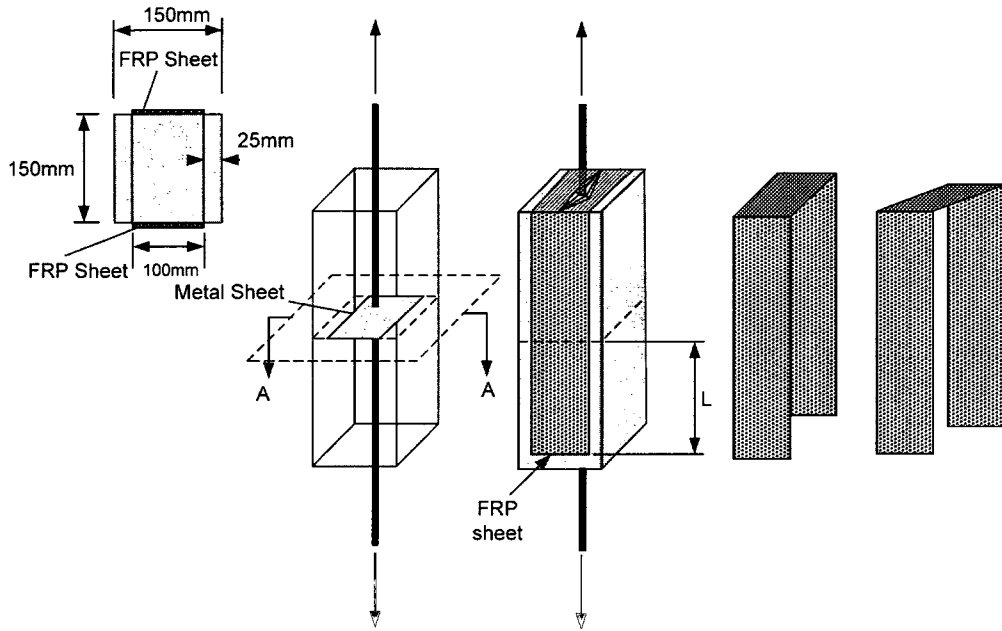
The schematic view of test specimens with U-shaped CFRP strips
